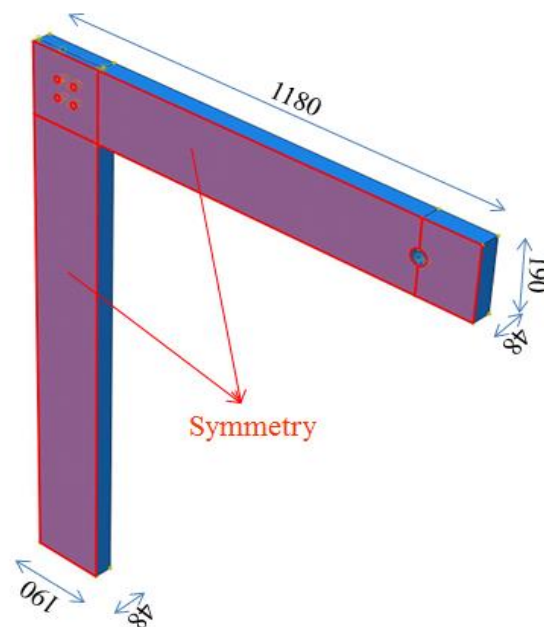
13 - Detailed structure of L-shaped connection.
